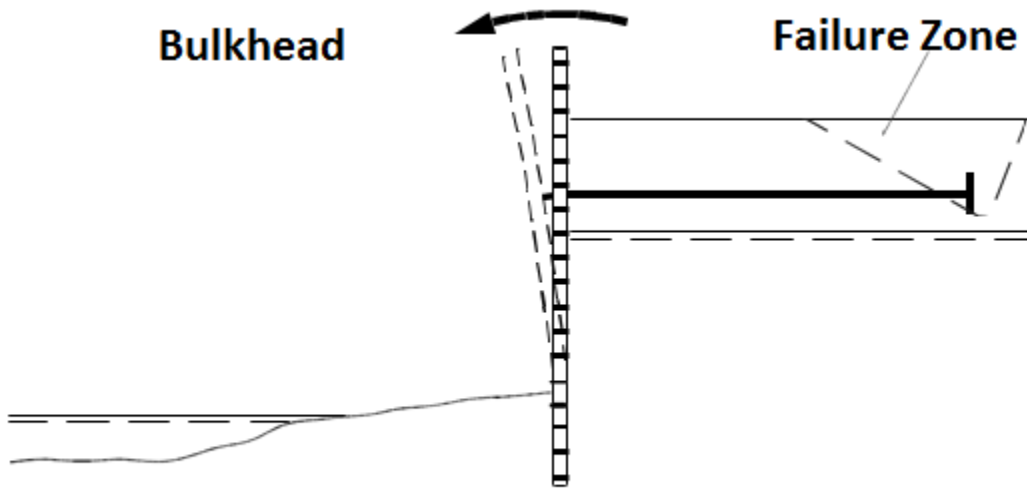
Anchor pullout and seaward tilt of sheet wall.
